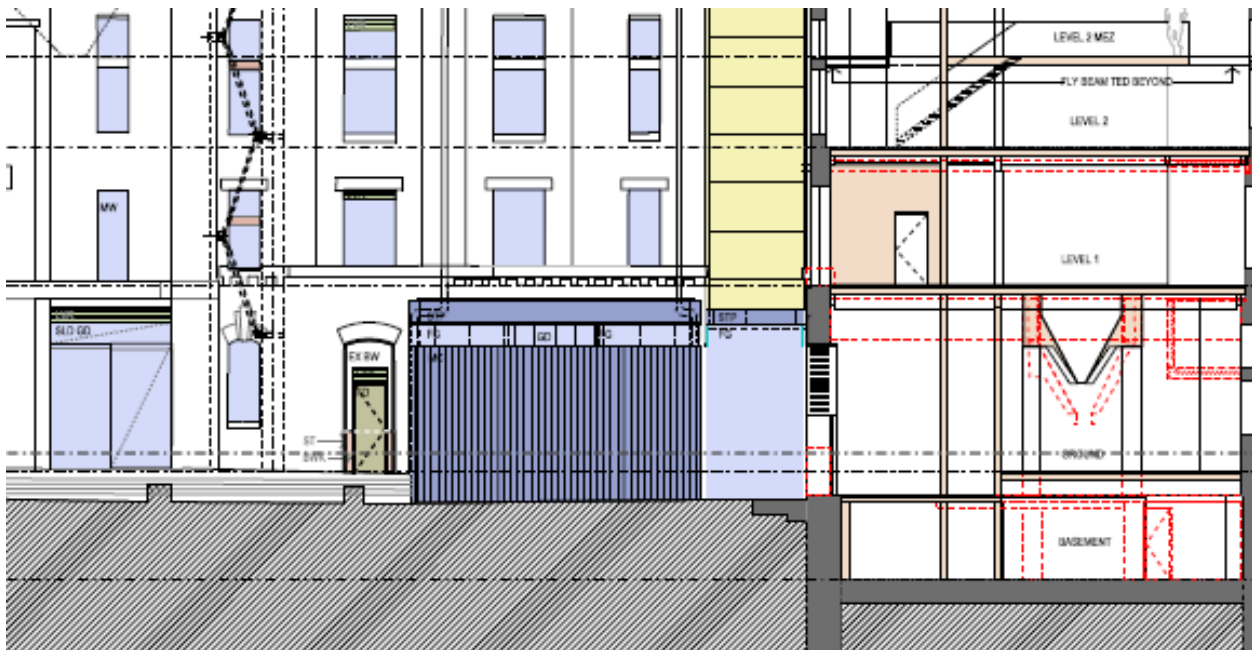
Extract of Proposed Western Elevation (showing new ground floor entrance attached to the western elevation of Building 26)
